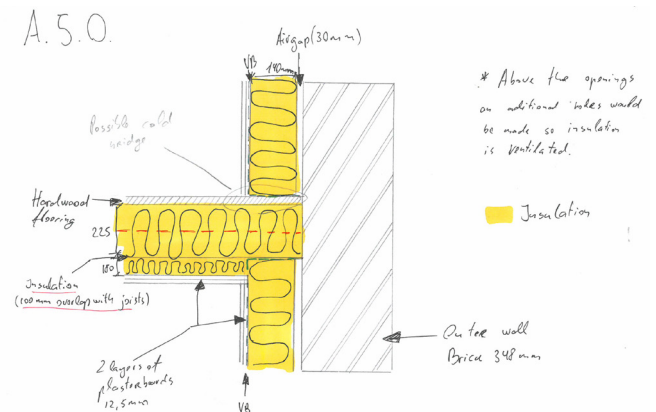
Sketch: Connection of new insulation with the old brick wall
